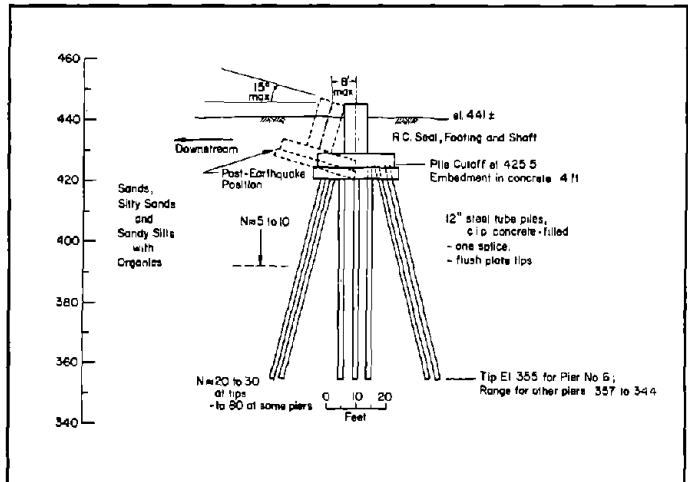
Construction and Displacement of Concrete Pier, Bridge 605A (after Ross et al., 1973).
